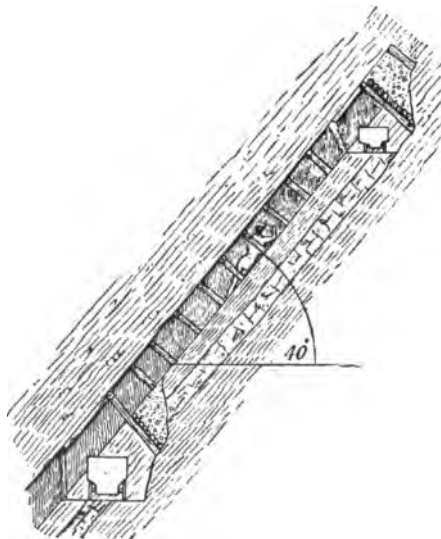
Section across level gates, showing longwall working place in steep measures.
